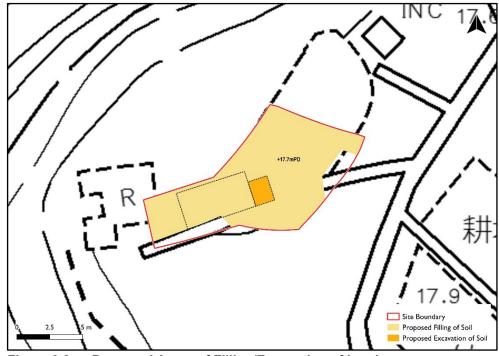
Proposed Areas of Filling/Excavation of Land
